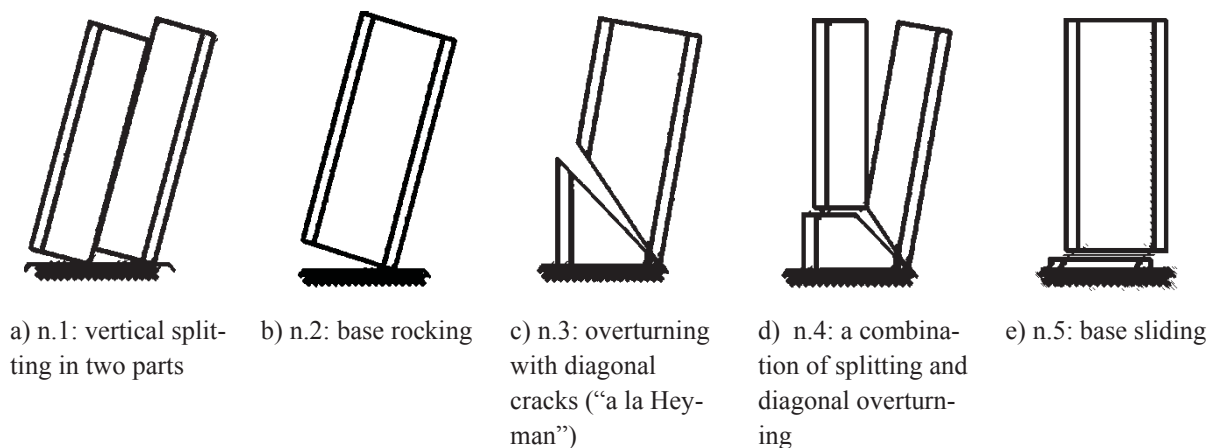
Collapse mechanism for masonry towers selected in [7] (images adapted from [7]).
